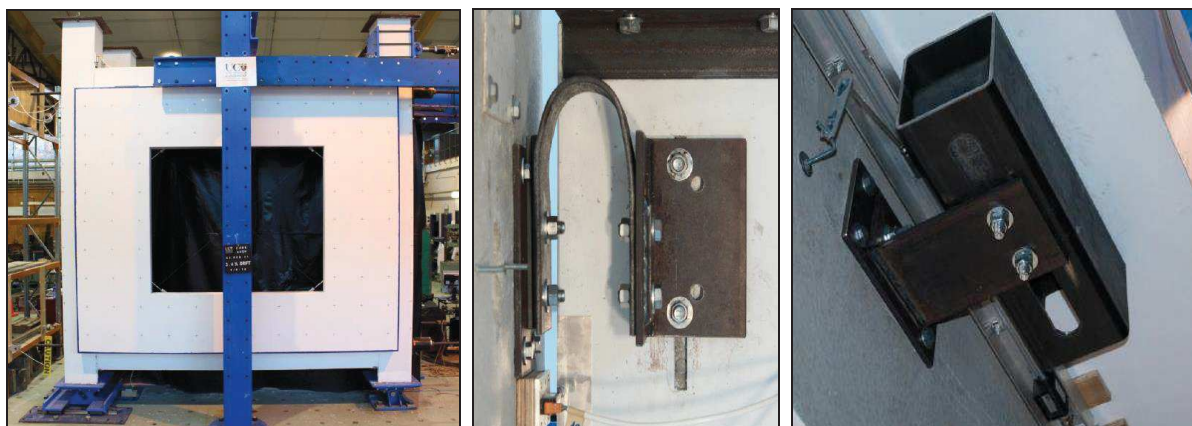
Left: experimental test on the low-damage precast concrete cladding system; Right: different configurations (unhoused or housed) of the UFP connections (Baird 2014).
